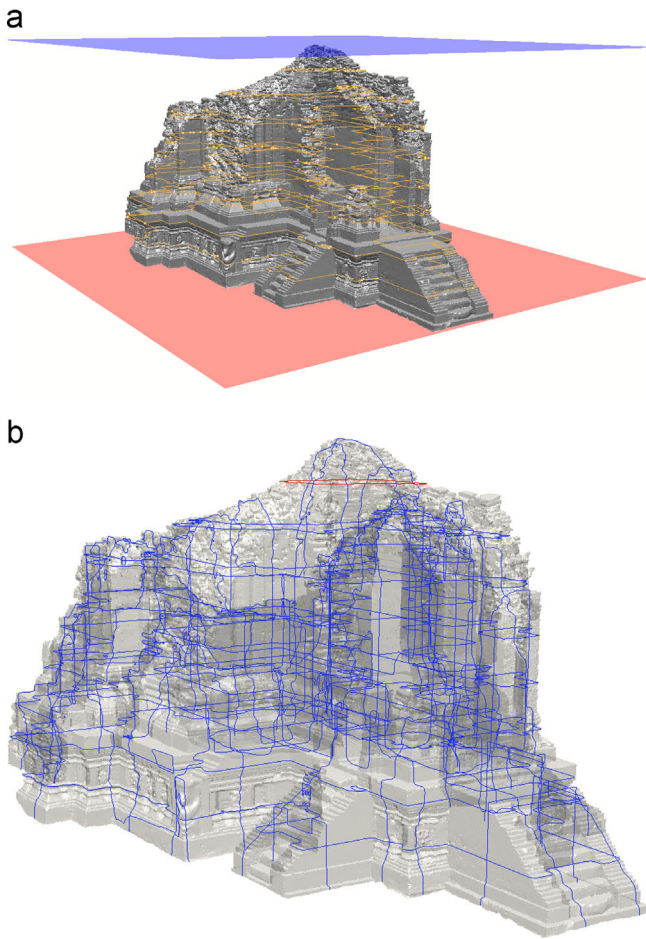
Extraction of planar sections on the reality-based 3D model of the Kalan as starting elements of the building digital reconstruction: (a) horizontal sections (xy plane); (b) vertical section (xz and yz planes).
